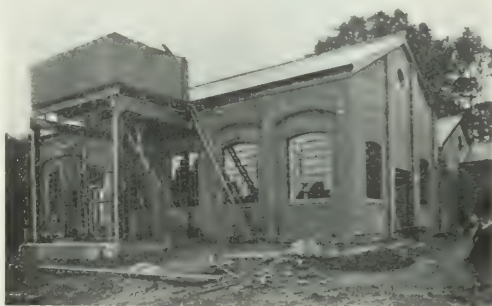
VIEW OF GAS PRODUCER PLANT.
